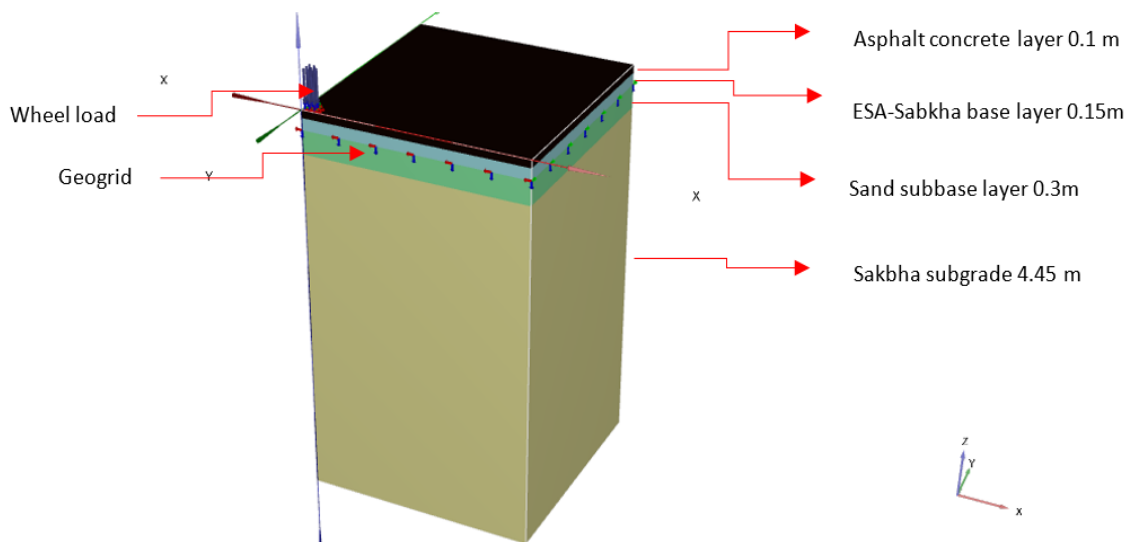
Axisymmetric finite element modeling of a geogrid-reinforced pavement structure at the bottom of stabilized ESA-sabkha base layer
